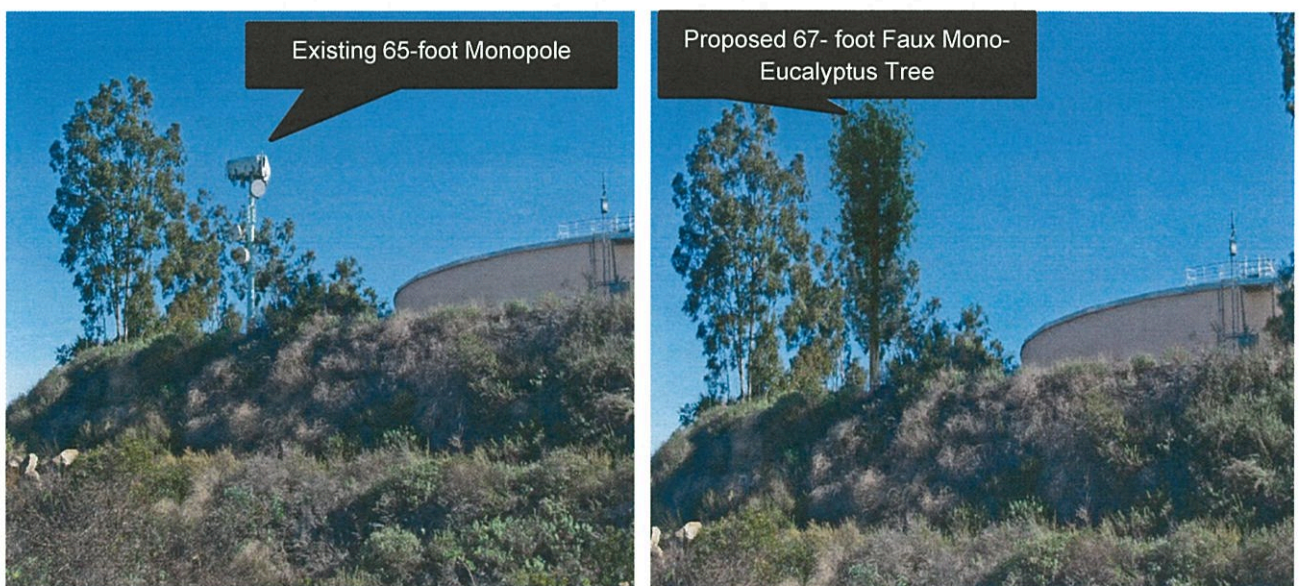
View of existing site (left) and proposed facility (right) looking northeast to the property.
